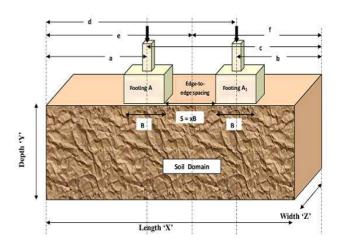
Typical Sketch of 3D Geometrical Soil Model Multiple Square / Circular Footings Resting on Soil Surface
